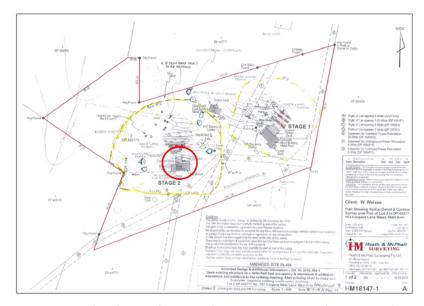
Site plan showing location of existing structure to be converted to a dwelling (red circle). Larger image in Appendix A.
